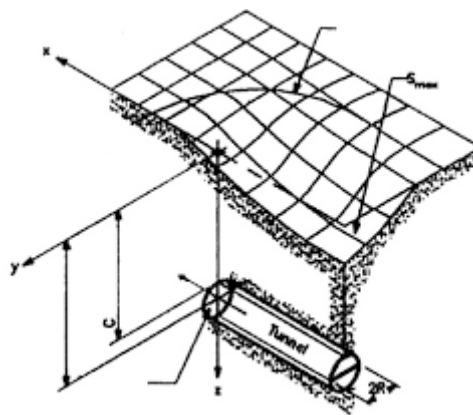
The ground settlement developed as the tunnel been constructed (Leca, 2007)
